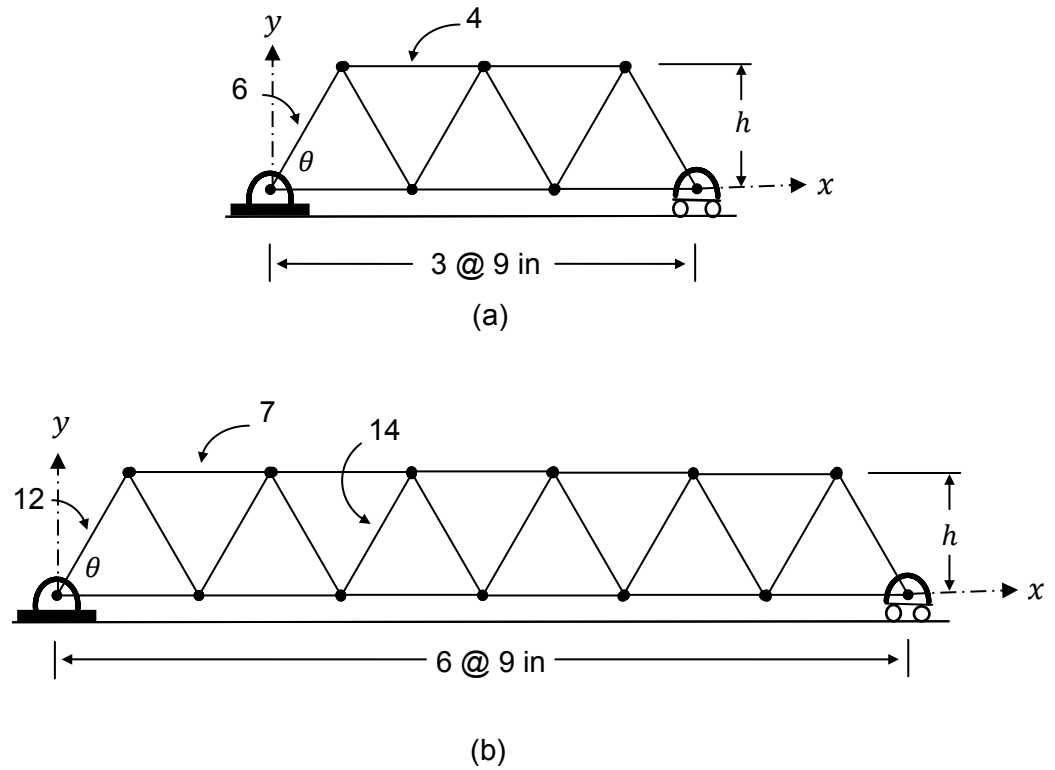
(a) Warren Truss – 11 Members with Two Damaged Members. (b) Warren Truss – 23 Members with Three Damaged Members.
